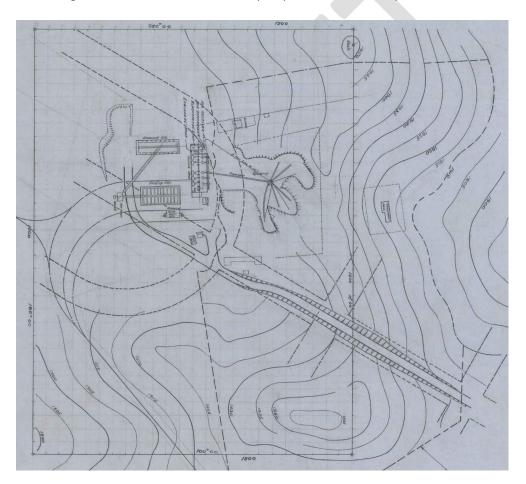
Canberra Brickworks site plan, 1926. North is at top Source: National Archives of Australia
